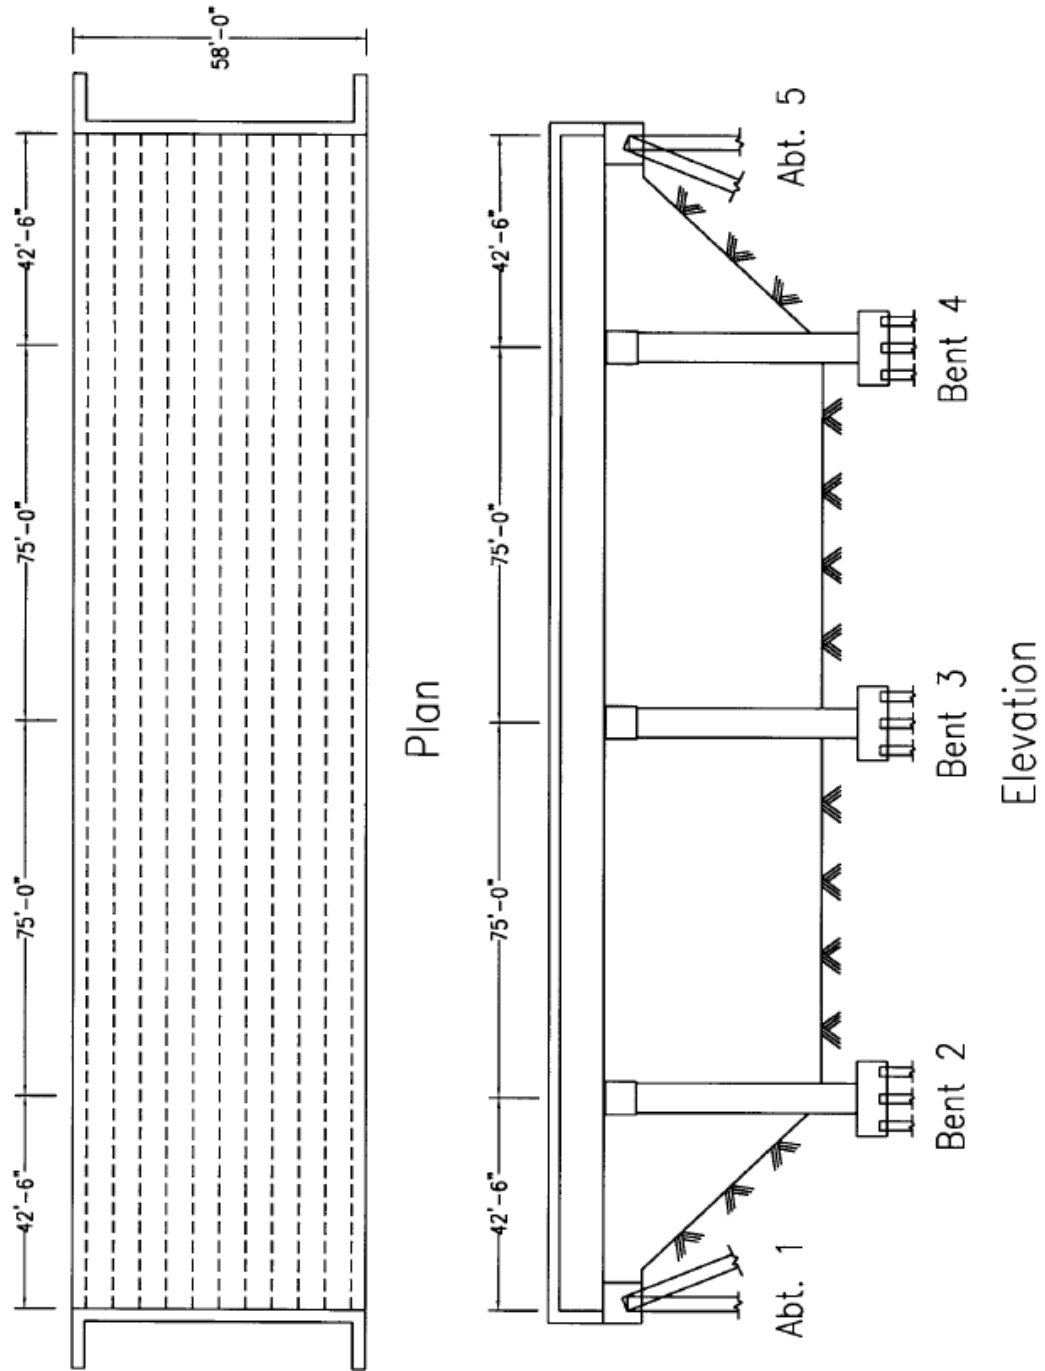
Plan and elevation view of the bridge. (After Hwang ;2001)
